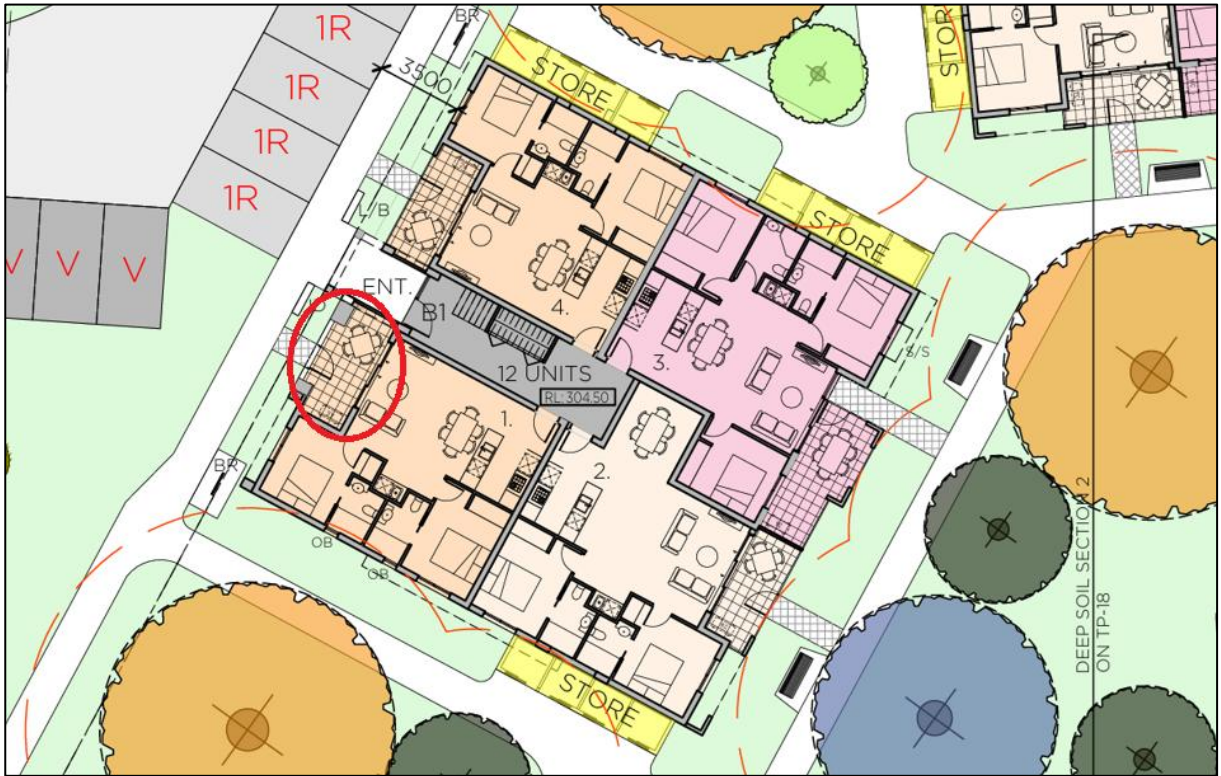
Ground Floor Plan of Block 1 with an example of the secluded private open space circled
